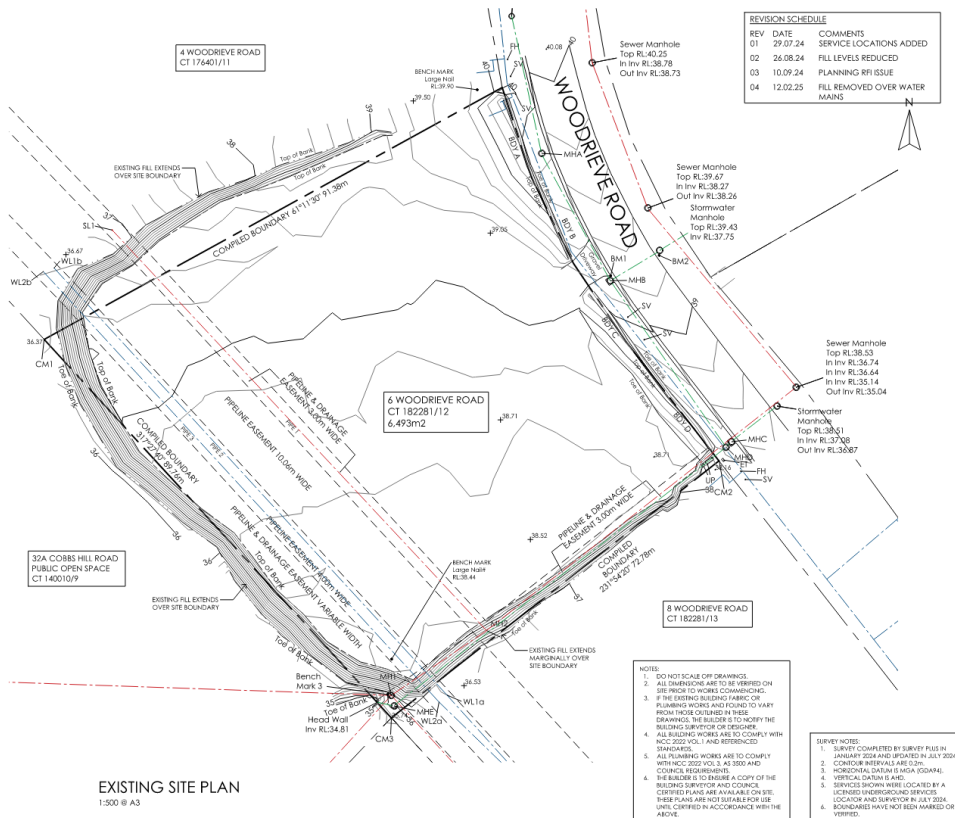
Existing site plan (with unapproved land fill) (source: the application)
